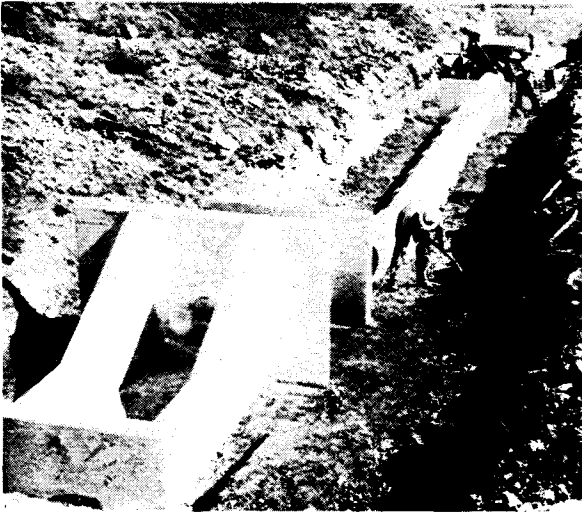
Precast concrete pipe culvert with type 3 inlet transition. P482-417-824
